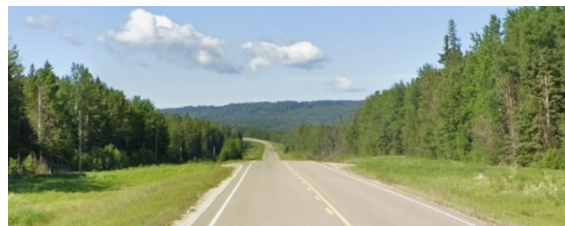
Road Section (1) - Frame 480 (Sag)
